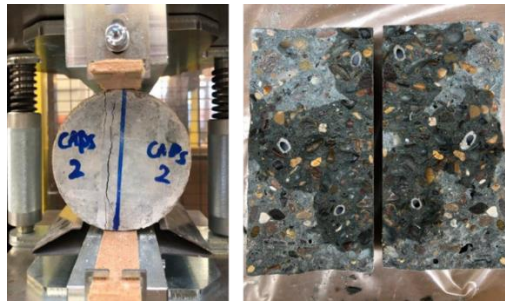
Splitting the cylindrical specimens to count the amount of broken capsules in a certain crack plane (note: the darkest concrete surface is the area covered by WRA)
